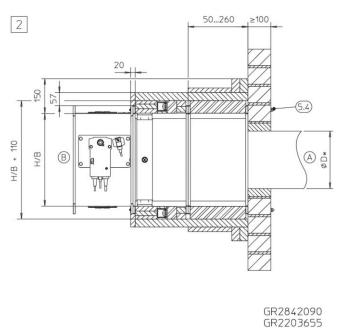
Dry mortarless installation adjacent to a solid wall, with installation kit WV
